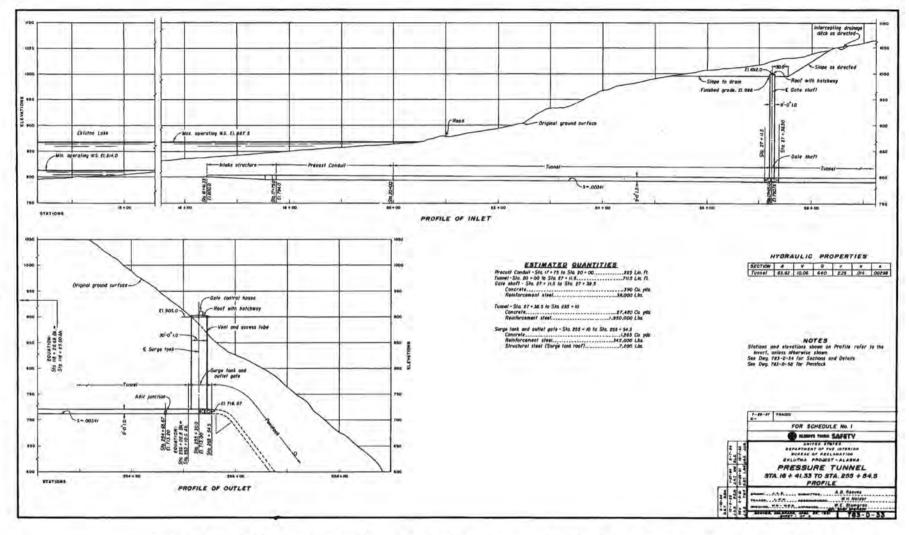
Profile of power conduit as originally constructed (including intake structure, intake conduit, pressure tunnel, gate shaft, and surge tank) from station 16+41.33 to station 255+54.5.
